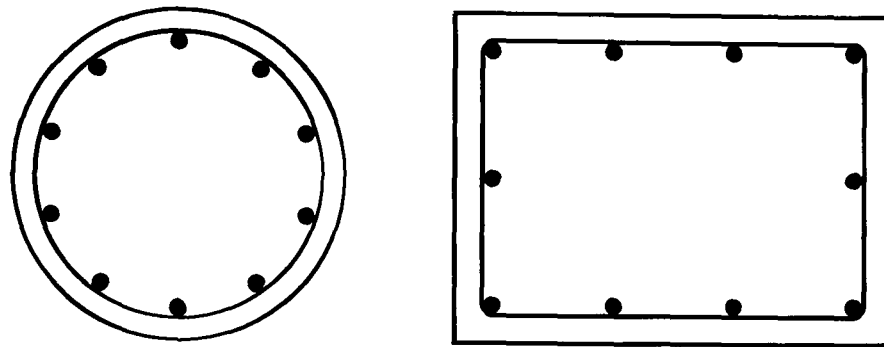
Typical Arrangement of Reinforcement in Circular and Rectangular Columns
